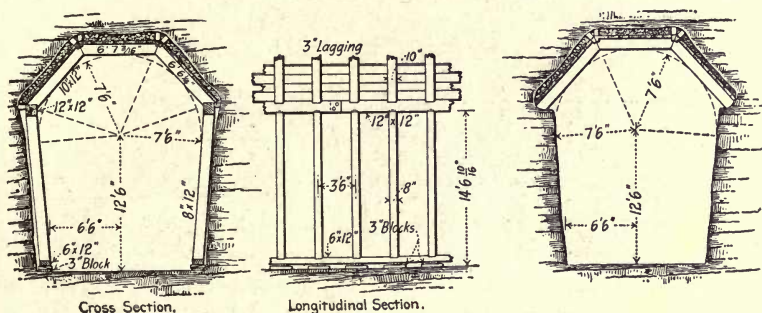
American Tunnel System: Little Tom Tunnel, Norfolk & Western Railroad.
